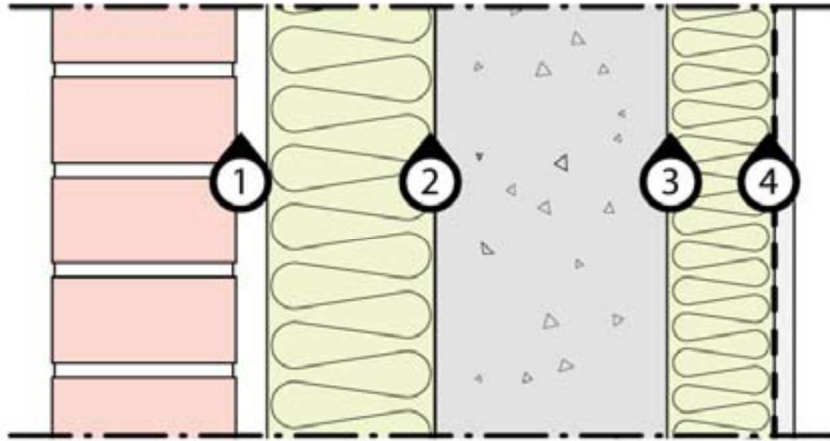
Exterior load-bearing wall (North and South) with new interior layer and sensor placements marked.
